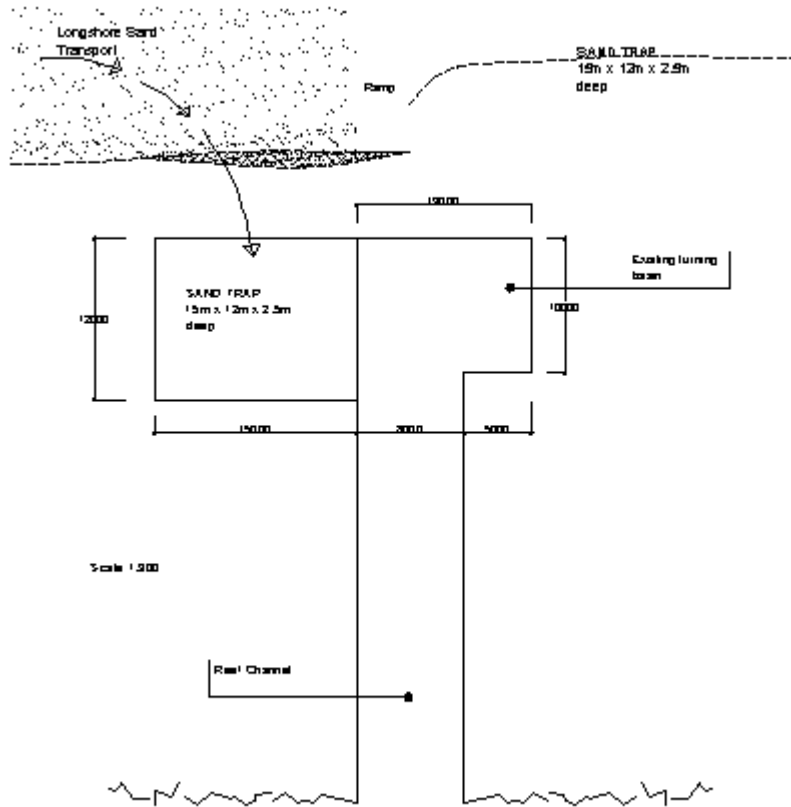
Concept of Sand Trap at Nanumaga Ramp
